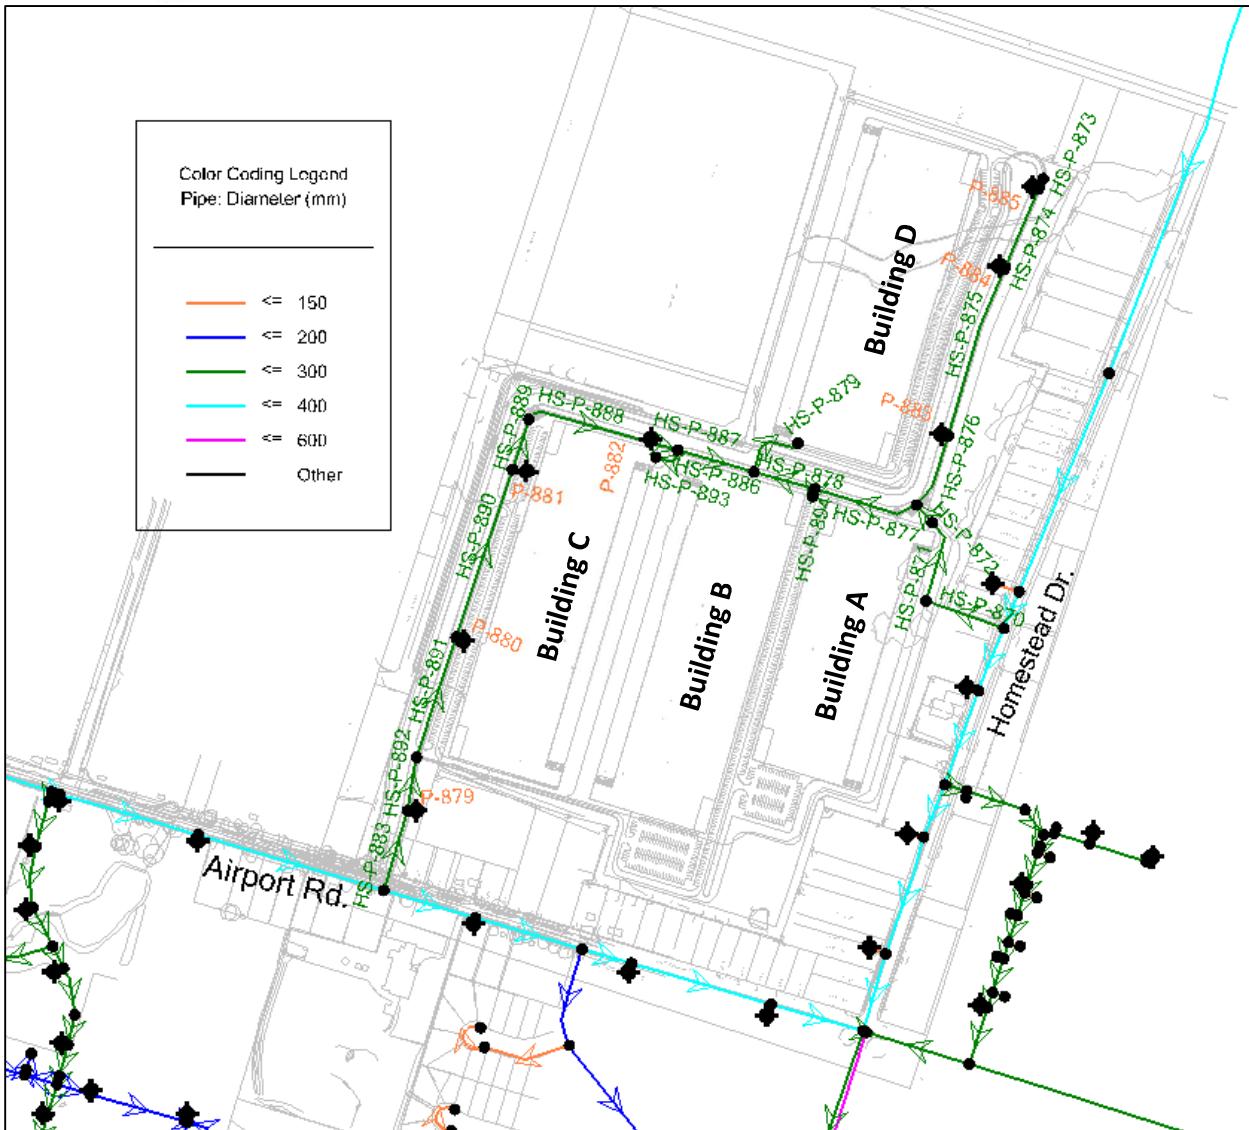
Proposed 3054 Homestead Drive Development System Layout with Pipe IDs
